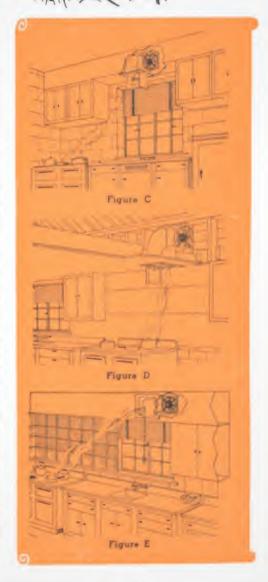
Figure C shows the ventilating fan in wall box installed in cornice, between kitchen cabinets, which has the wall box door installed in its bottom surface through which the steam, heat and cooking odors are drawn.
